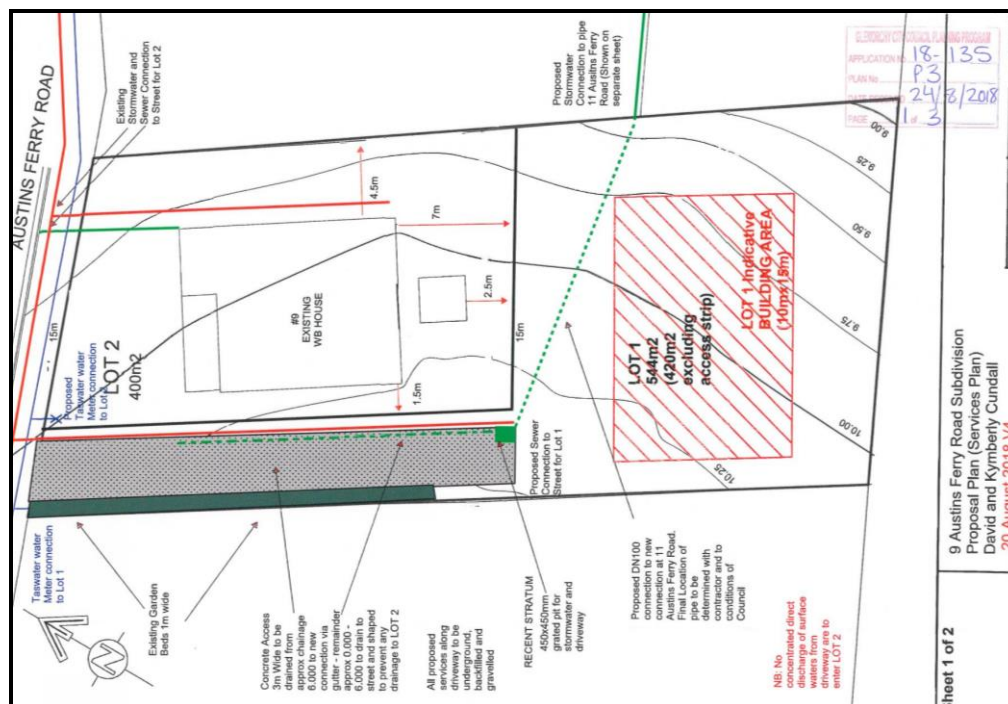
Site plan of 9 and 11 Austins Ferry Road, Austins Ferry.
